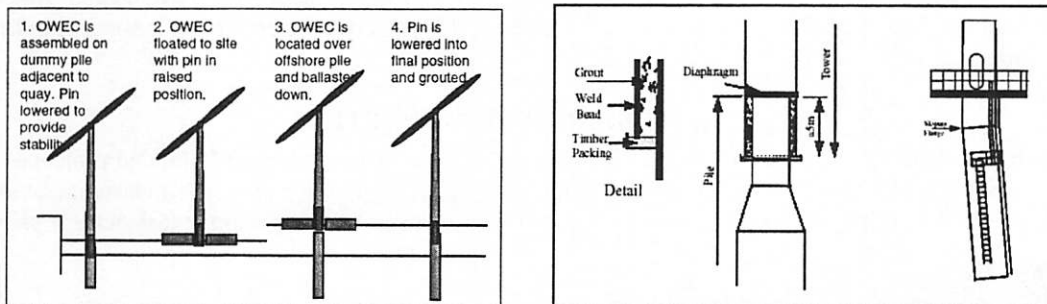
Installation of fully operational turbine and connection details between foundation pile and tower with misalignment correction
